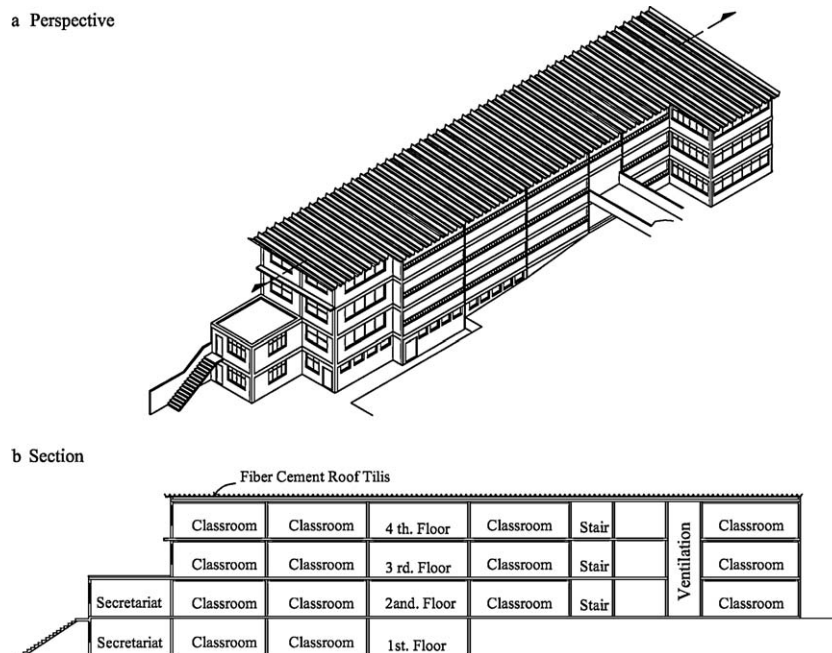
Plans of the annex building or brick annex building: (a) perspective and (b) section.
